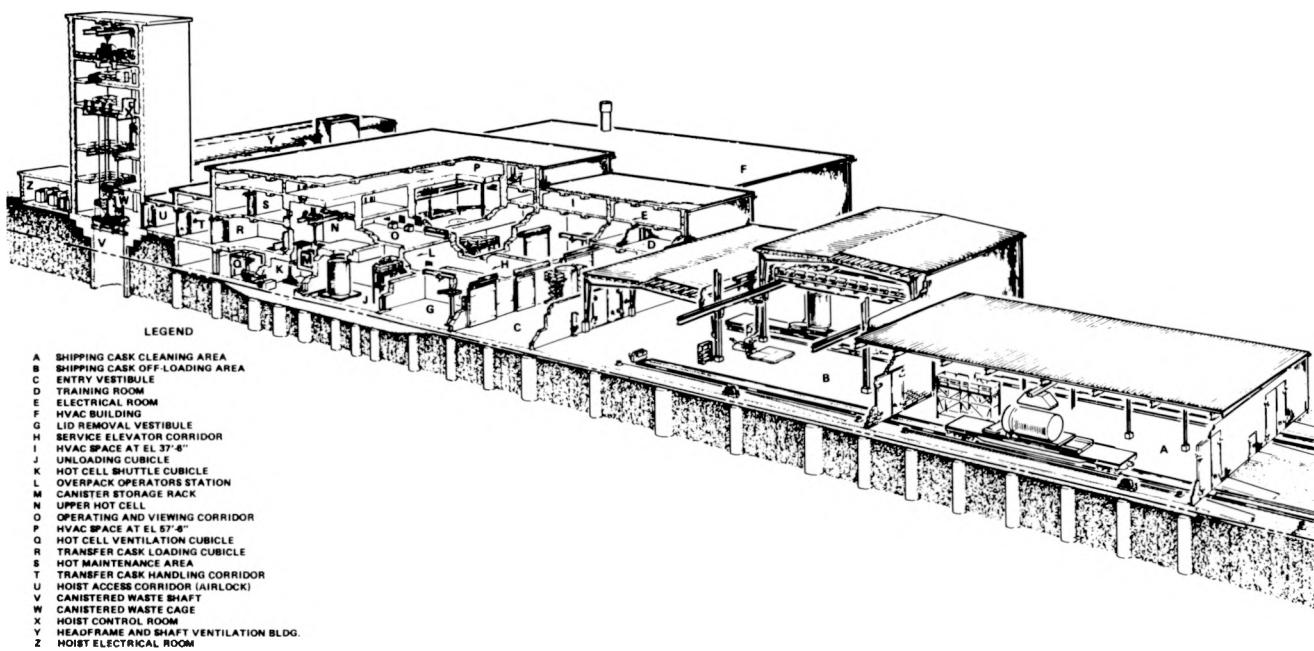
CANISTERED WASTE FACILITY SECTIONAL FACILITY
